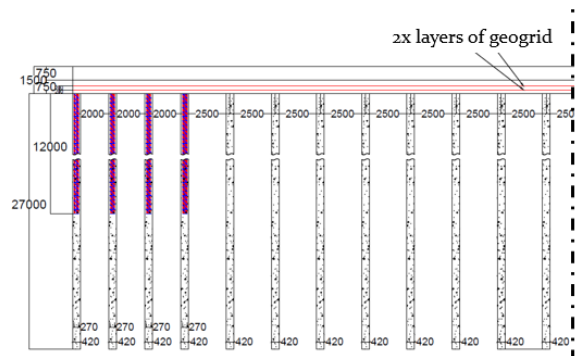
Section through the half of the coal stockpile showing the LTP, FDC's and reinforcement cage
